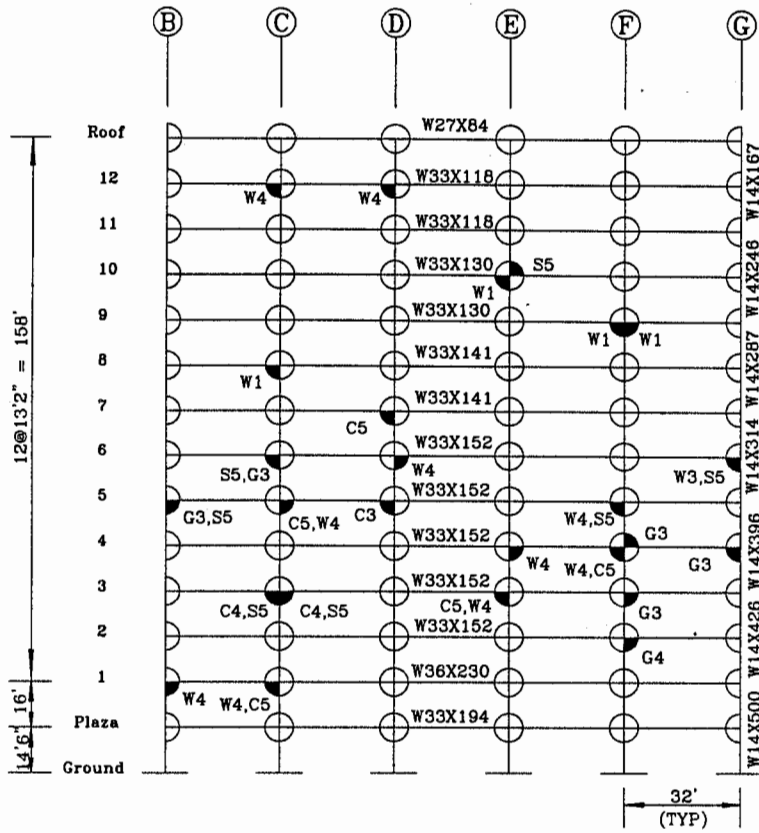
Elevation and Damage Pattern of the Frame (West Side)
